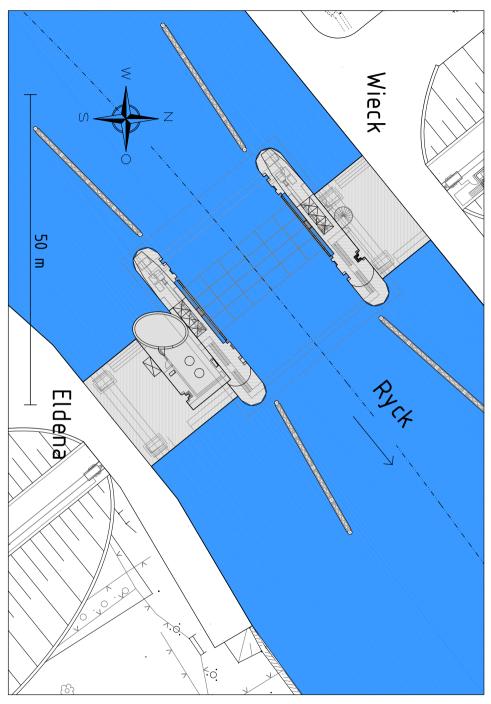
Layout plan of the barrage Greifswald-Wieck/© Staatl. Amt für Umwelt und Natur/Ueckermünde
